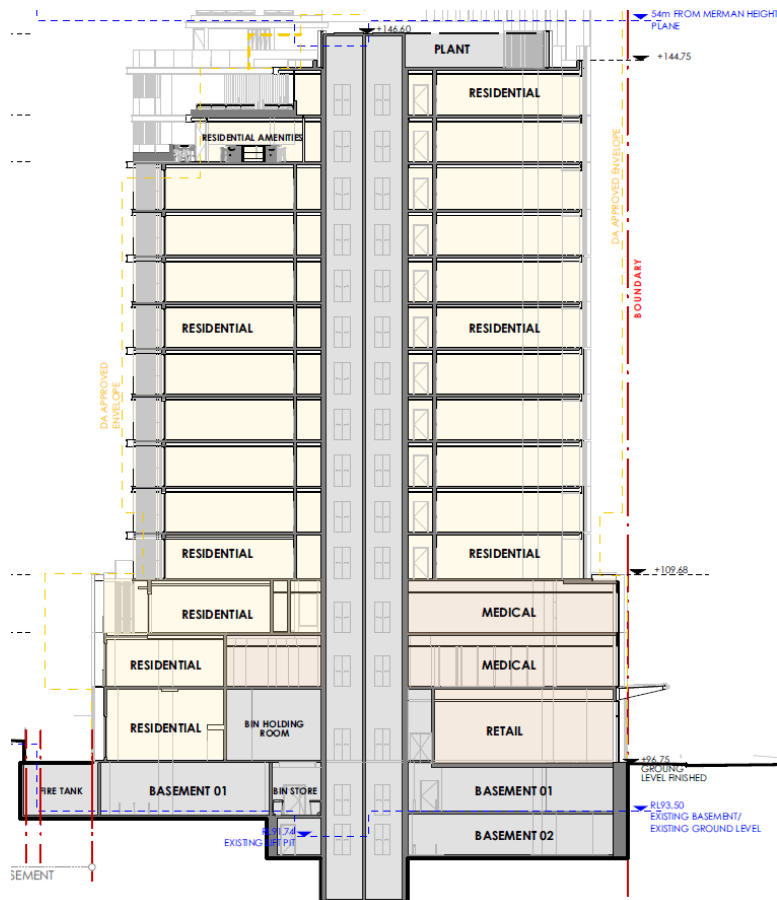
east/west section plan of south tower (Source: Fitzpatrick Partners)
